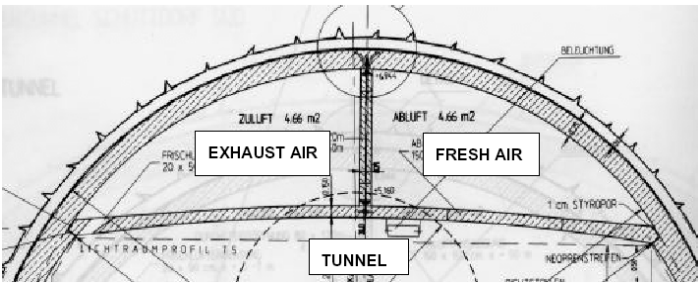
Typical tunnel cross-section with a suspended reinforced concrete ceiling.
